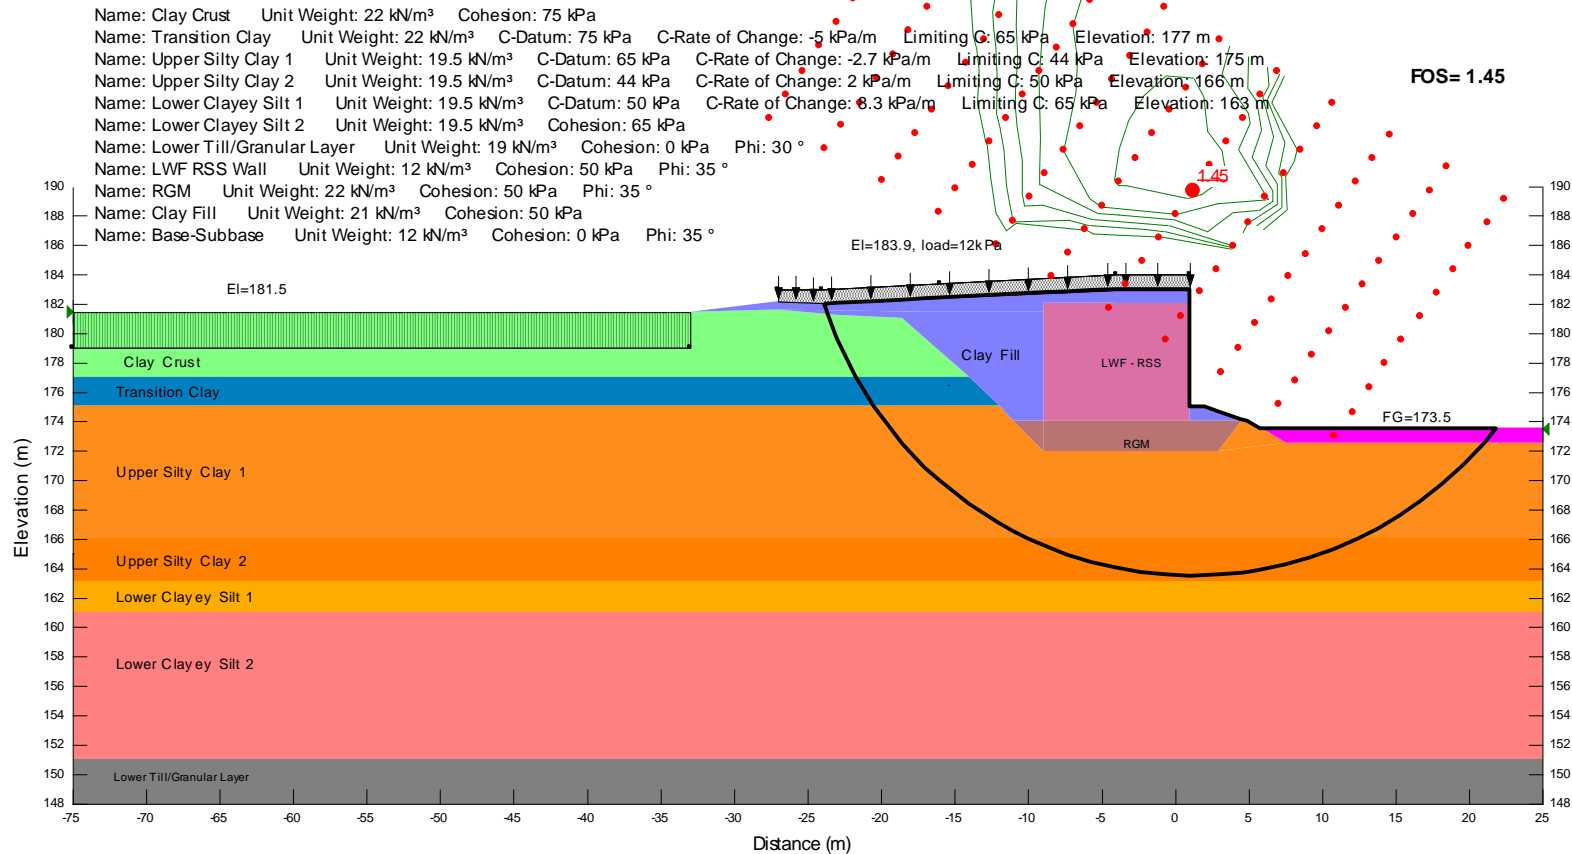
Slope Stability - Long Term - South Abutment - Station 10+450L Hwy 401
